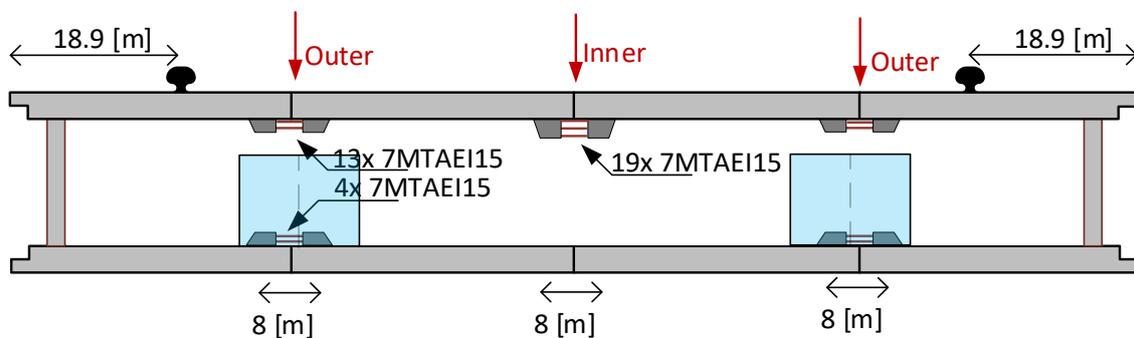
, POST-TENSIONED PRESTRESSING LAY-OUT; LONGITUDINAL VIEW
